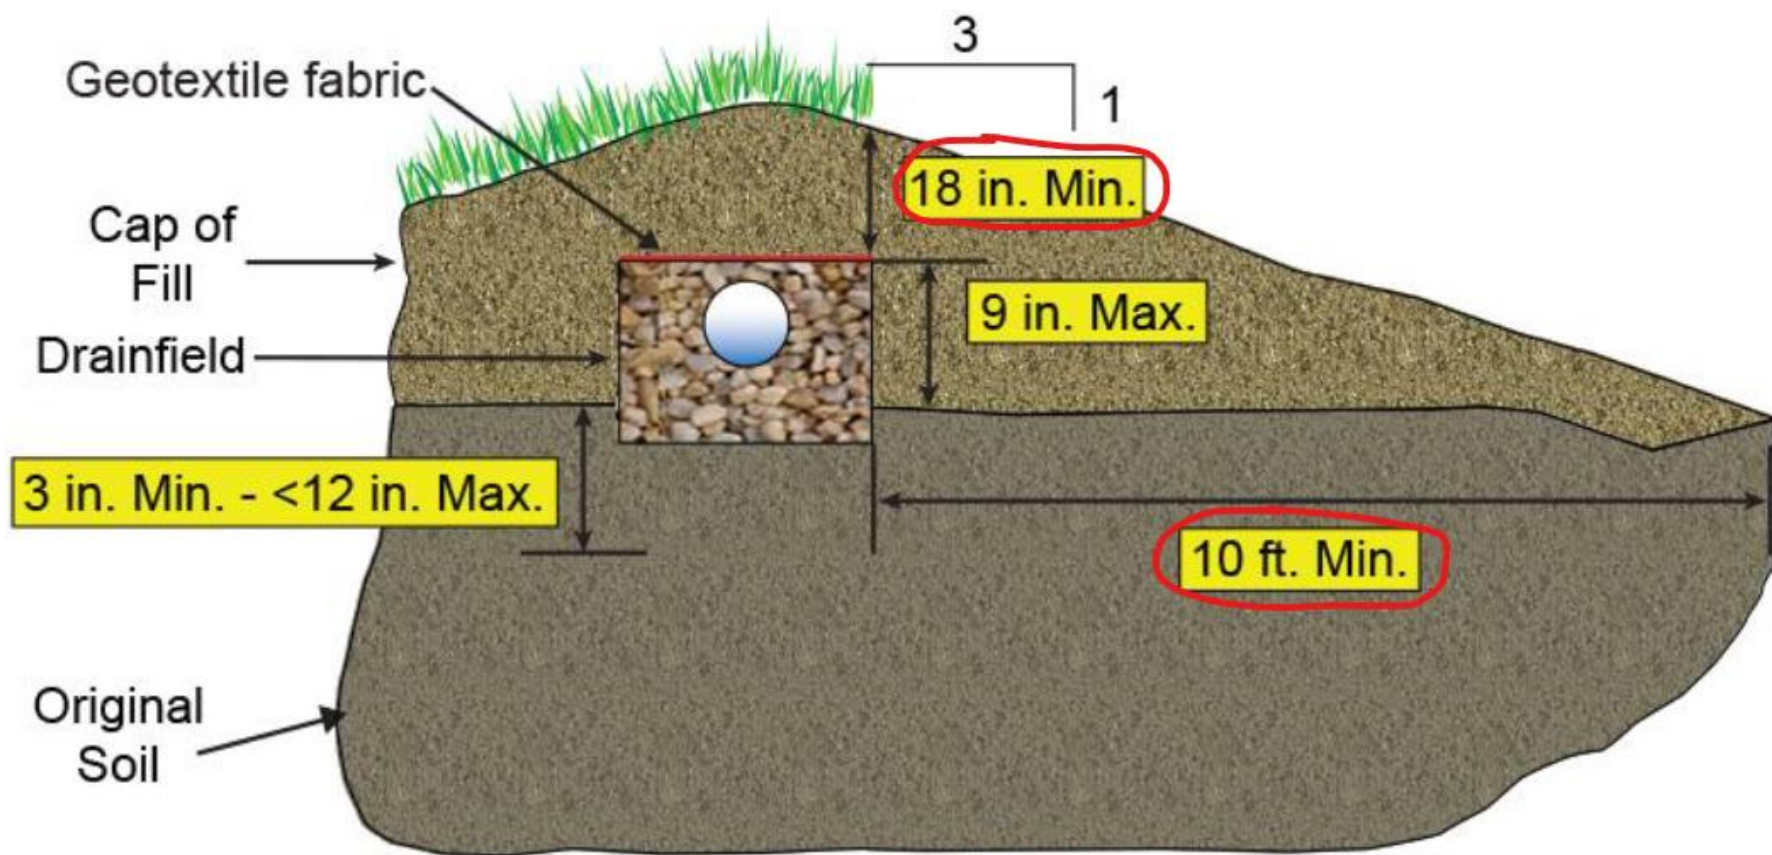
Cross-sectional view of an above-grade capping fill trench.
